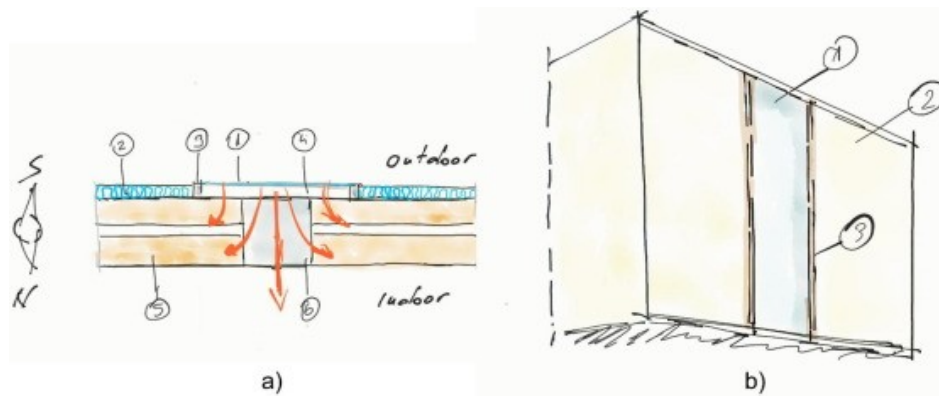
Conceptual drawing of the SBRS designed to correct the thermal bridges introduced by concrete columns (a) Horizontal cross section and (b) 3D View: 1 – External transparent skin (glazing); 2 – ETICS; 3 – Frame of the glazing; 4 – Air space of the SBRS; 5 – Masonry wall; 6 – Concrete column [84].
